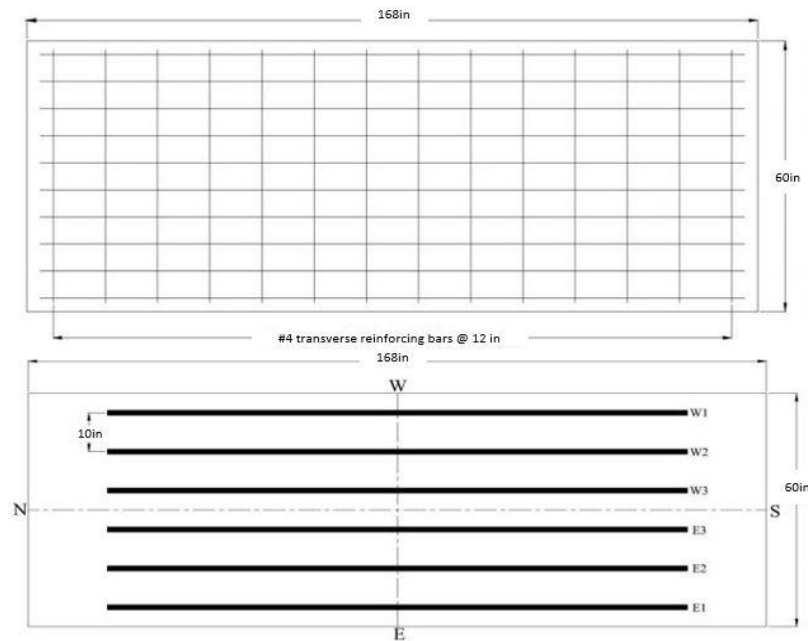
Specimen and retrofit details for the one-way slab, (Petrou et al., 2008).
